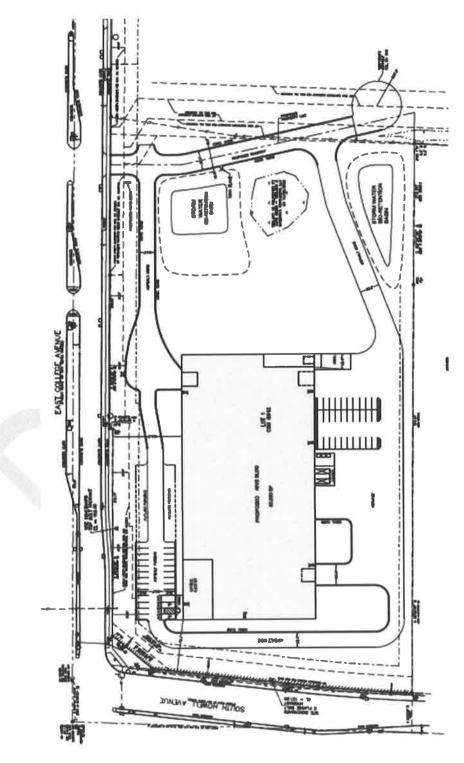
EXHIBIT A: GENERAL DEVELOPMENT PLAN ENLARGED
